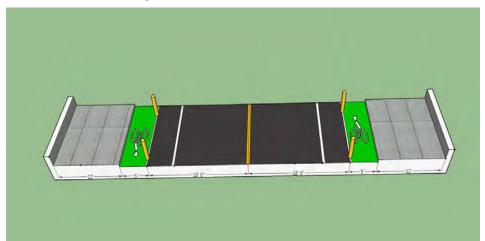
Proposed redesign of Cherokee Avenue bridge with painted and semi-protected bike lanes
